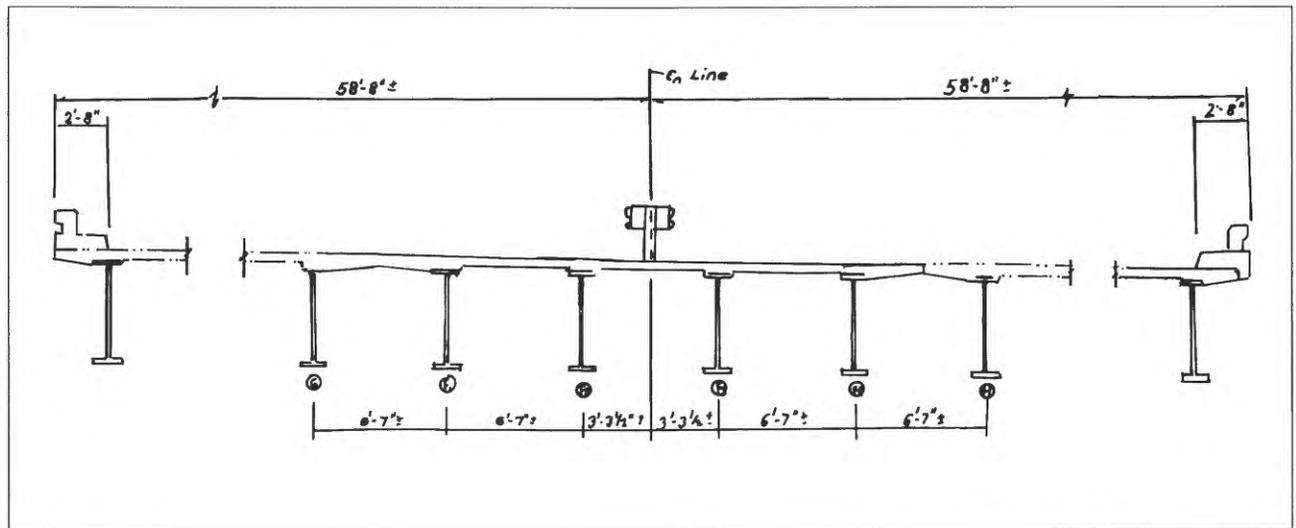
Section drawing for widening of Sierra Point Overhead.
